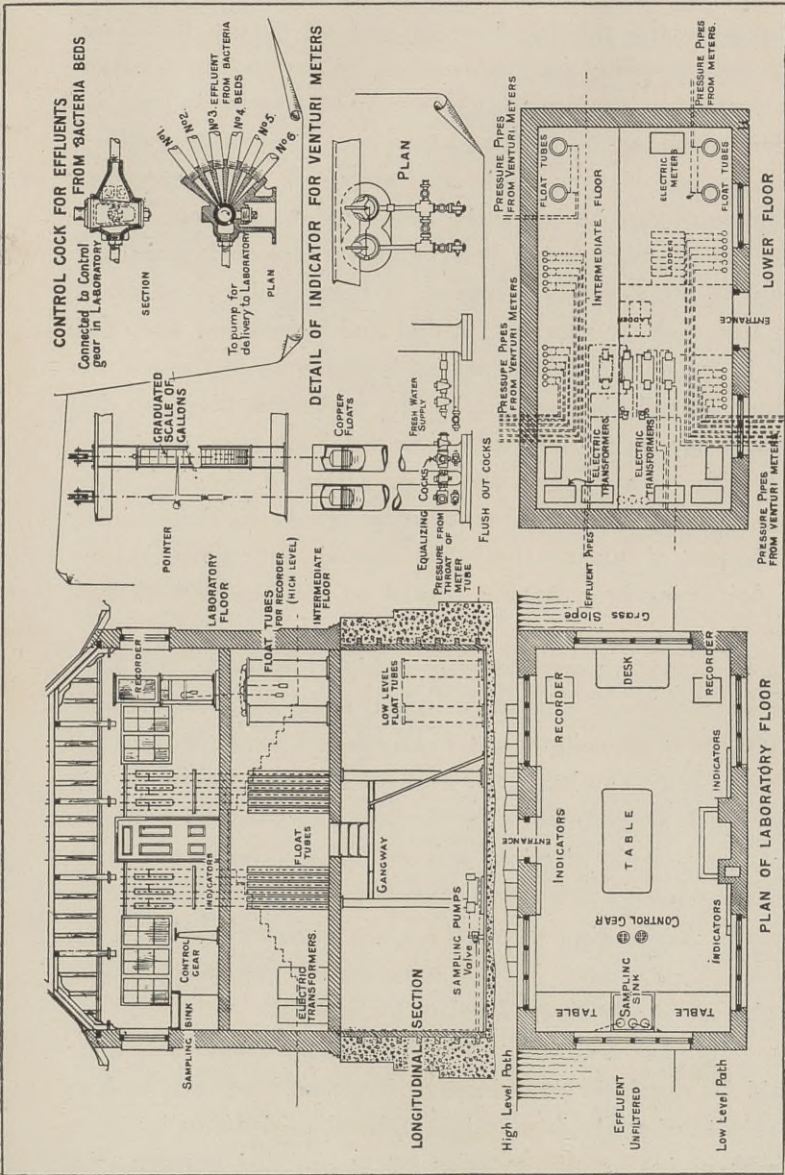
Details of Laboratory and Recorder House for Proposed Scheme of Central Control for the Hanley Sewage Disposal Works.
